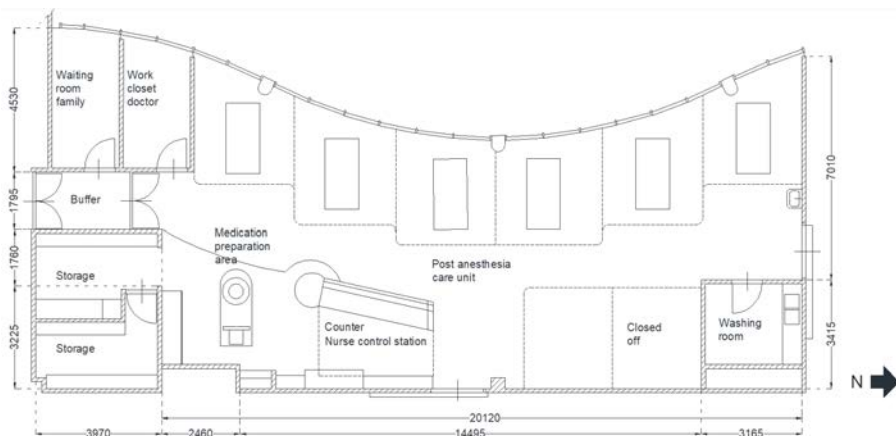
Floor plan of the case study PACU (dimensions in mm)
